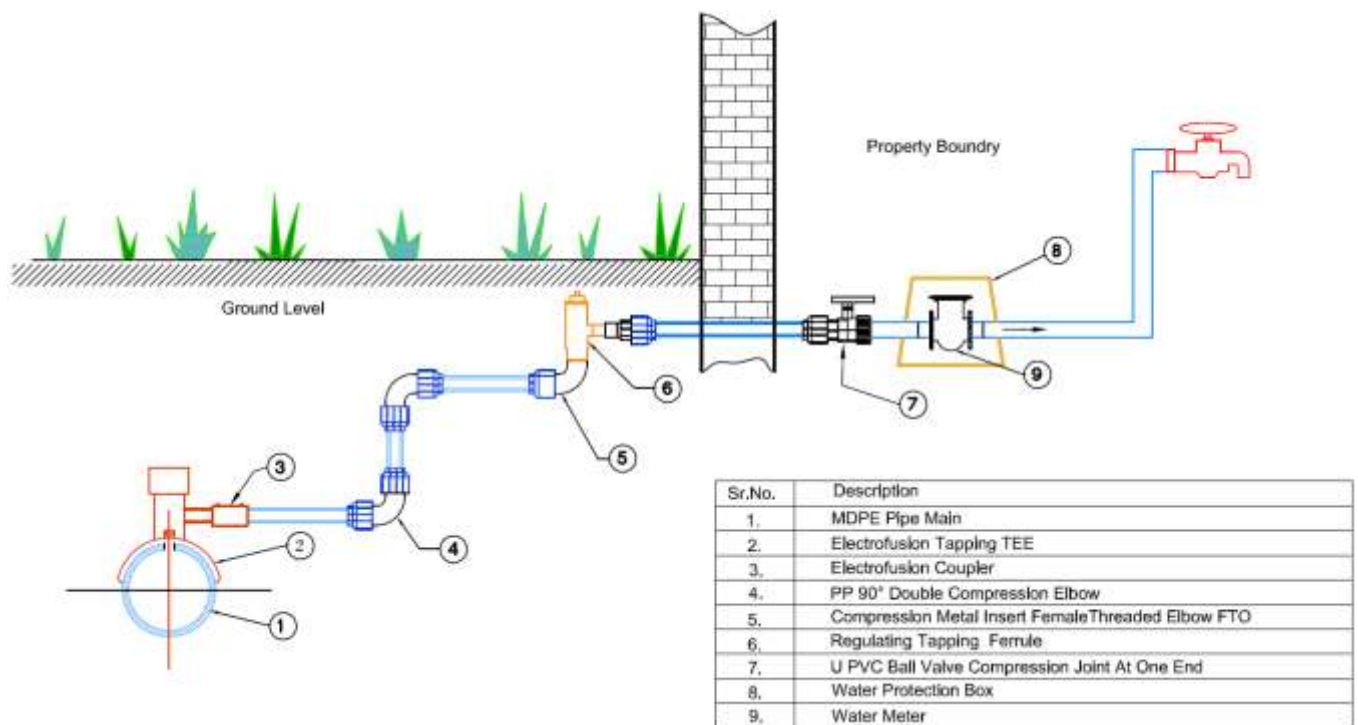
Typical House Service Connection with EF Tapping Tee on PE Pipe
